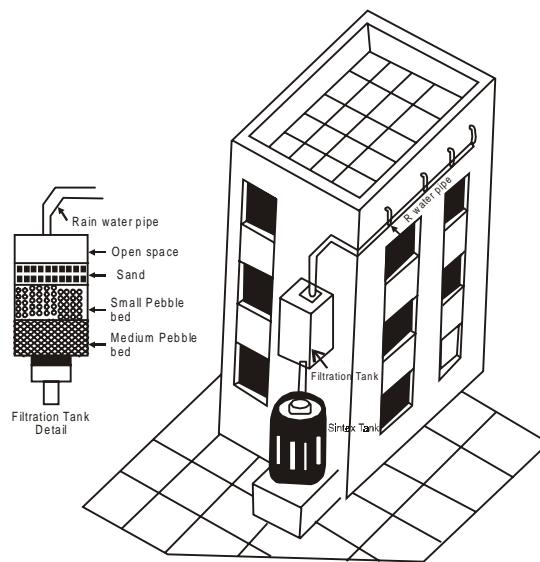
Roof water harvesting system at a slum tenement in Kuil Thotam, Chennai (Khurana, 1999).
